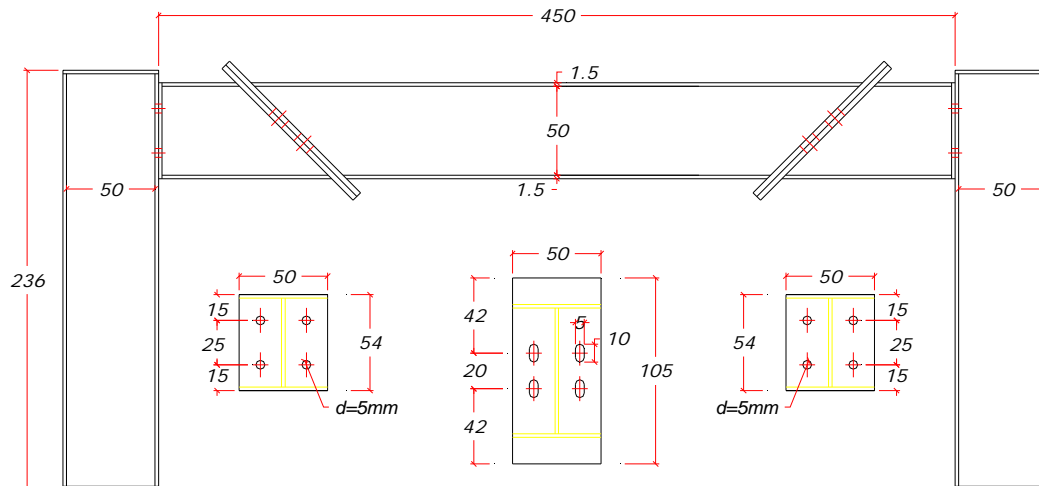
Geometrical Details of the Steel Beam with Slant End-plate Connection for Experimental Study (Small-scale Specimen). All Units are in mm
